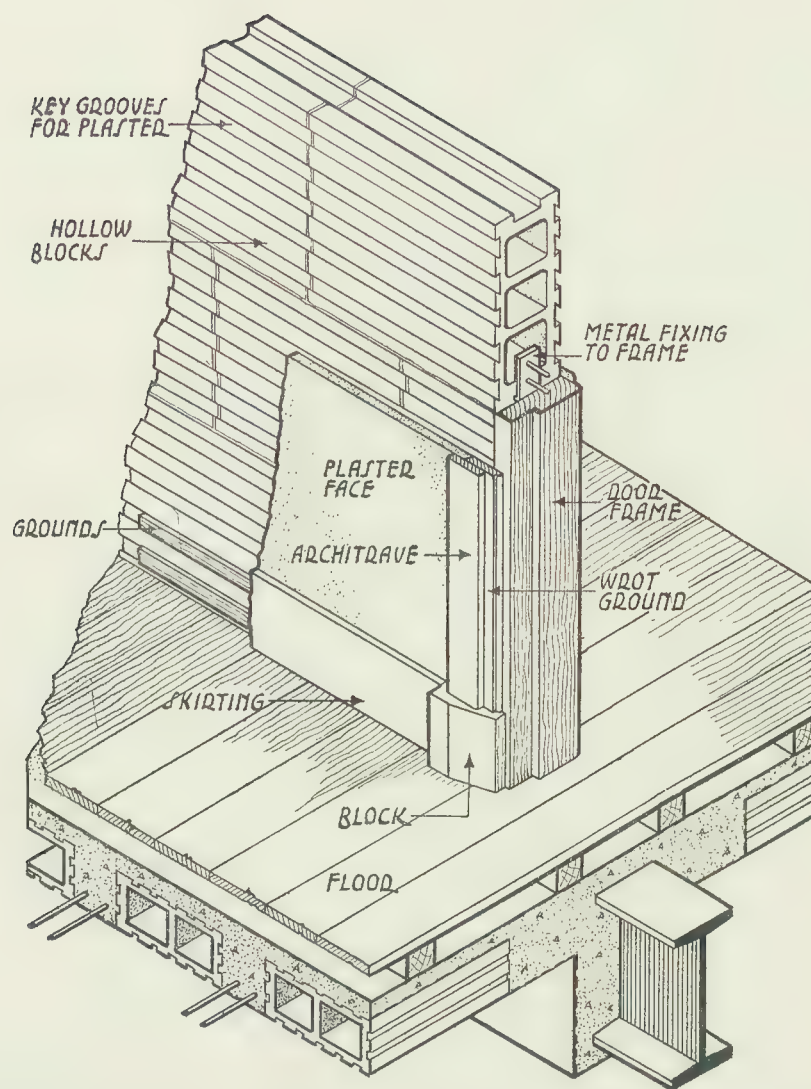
HOLLOW BLOCK PARTITION WALL AND FINISH AT JAMB OF A DOOR OPENING
